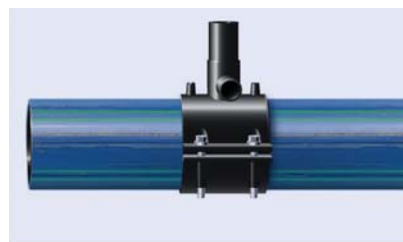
The tapping fitting is welded securely to the egeplast SLM[®] RC^{plus} pipe
